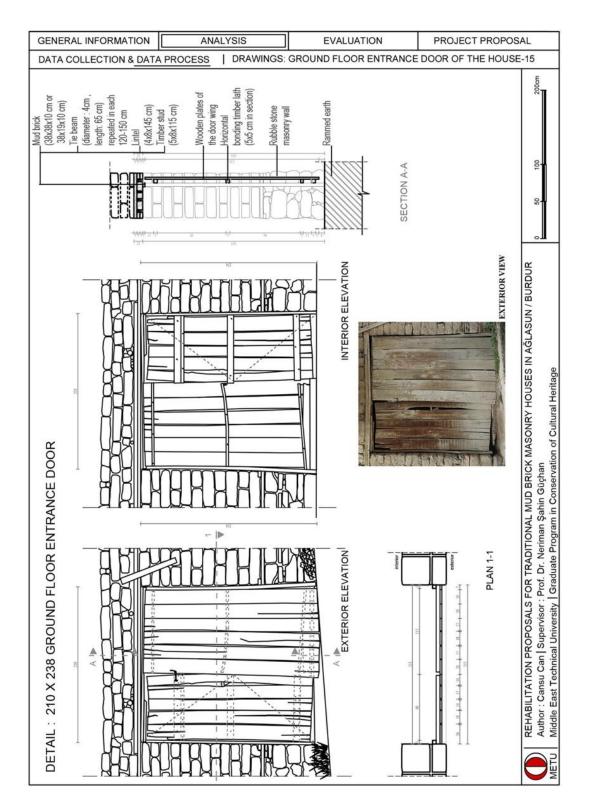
Detail Drawings of Grounf Floor Entrance Door (House-15)
